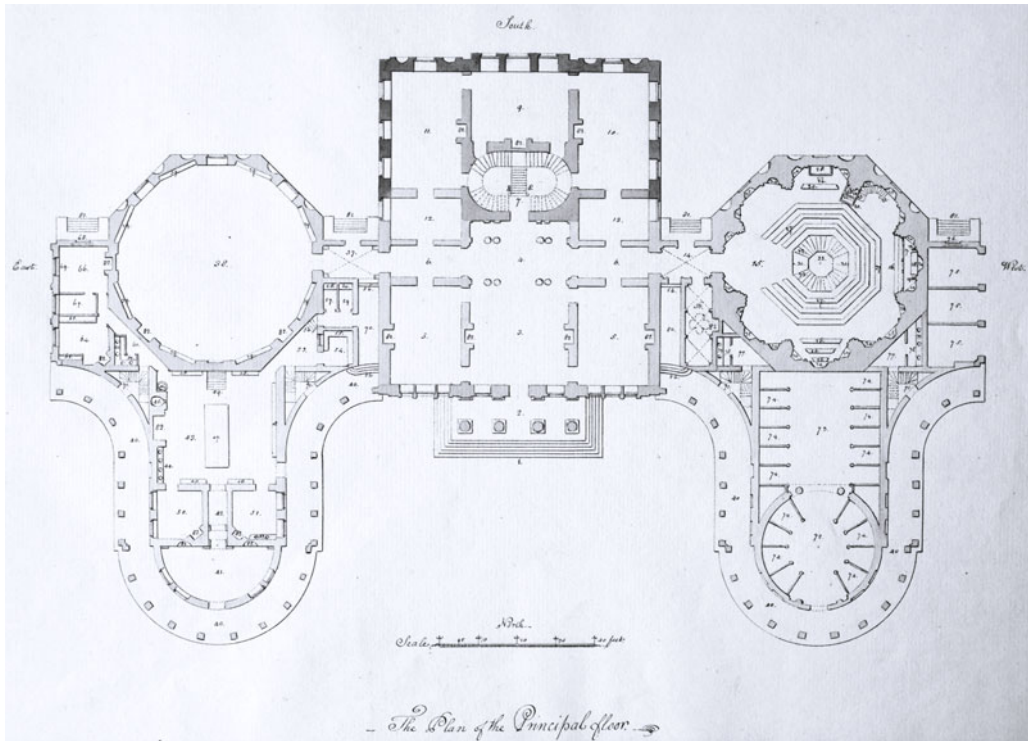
John Carter, plan of the ground floor of Bywell Hall. Walls of Paine's house in black.
